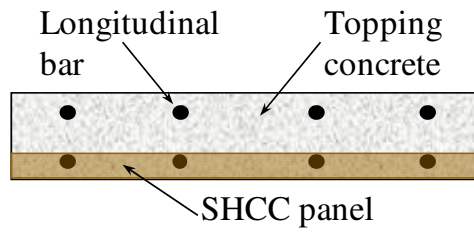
Cross-section of cast-in-situ SHCC and reinforced concrete slabs
